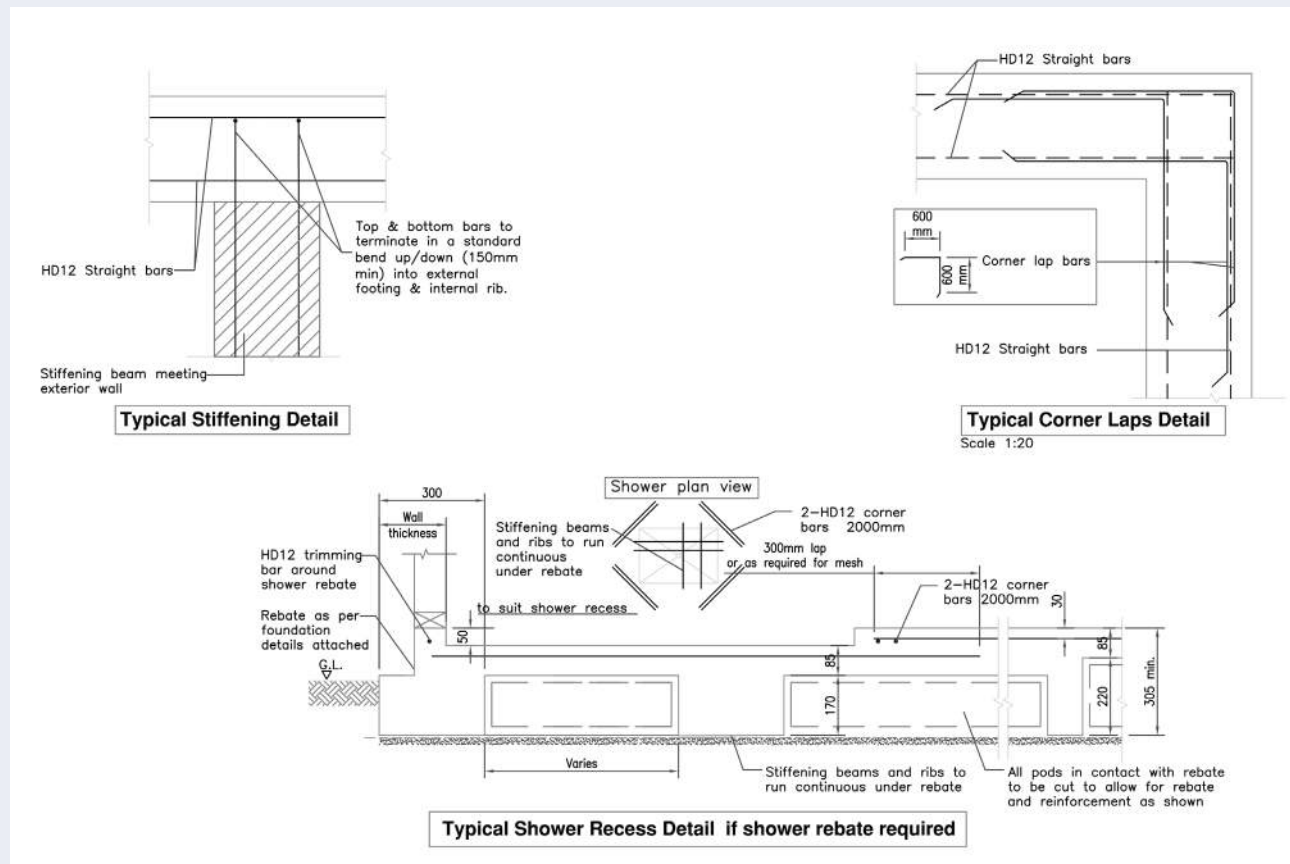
Typical shower rebate details and corner bar lap detail
